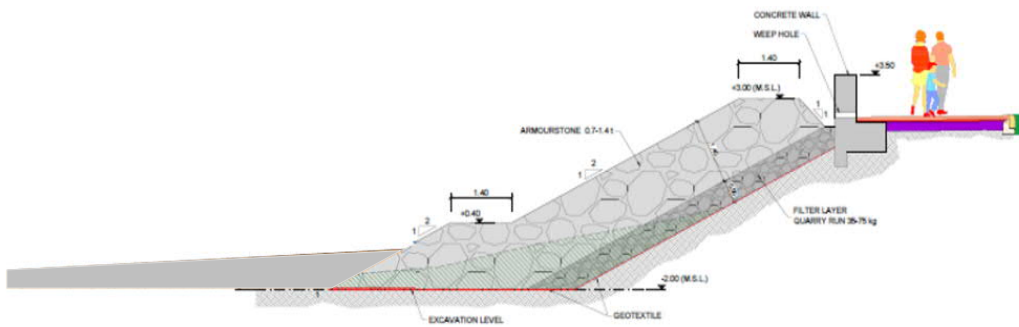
Cross section at Lagarto Bay. Alternative C at the Feasibility study
